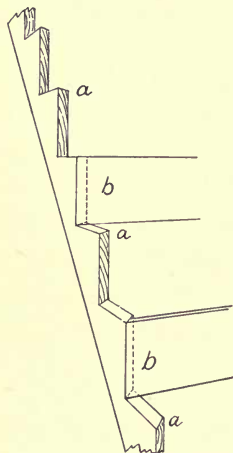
INTERSECTION OF RISERS AND FACE STRINGER.
